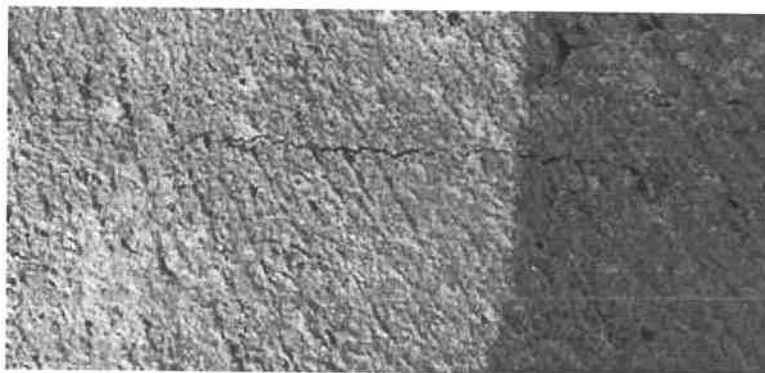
Appearance of a crack on the surface of a concrete slab due to the plastic shrinkage
